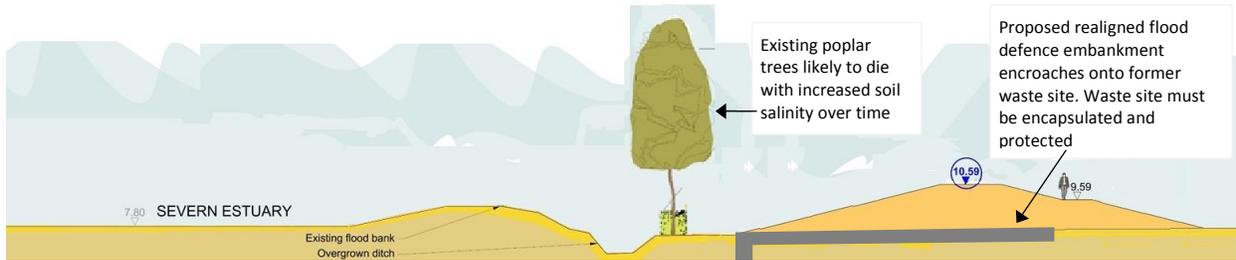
Typical Cross Section Through Alternative Flood Defence Embankment Encroaching into Former Waste Site
